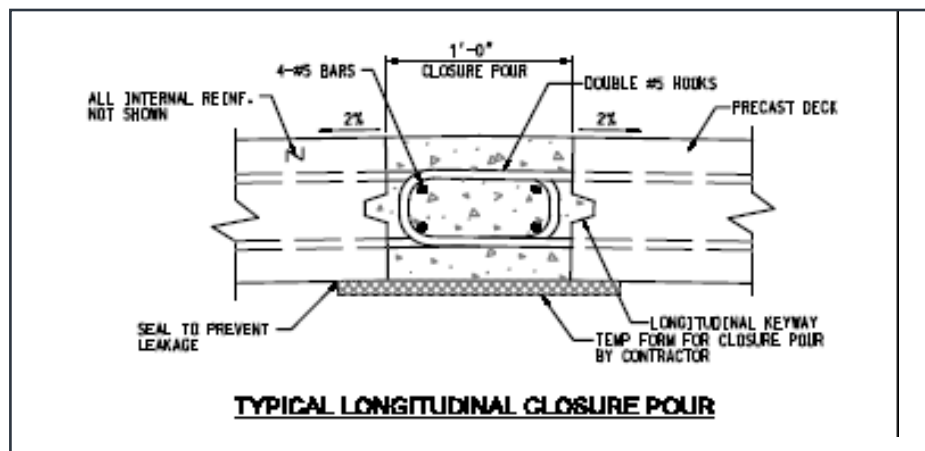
Full-depth precast concrete deck panel longitudinal connection
